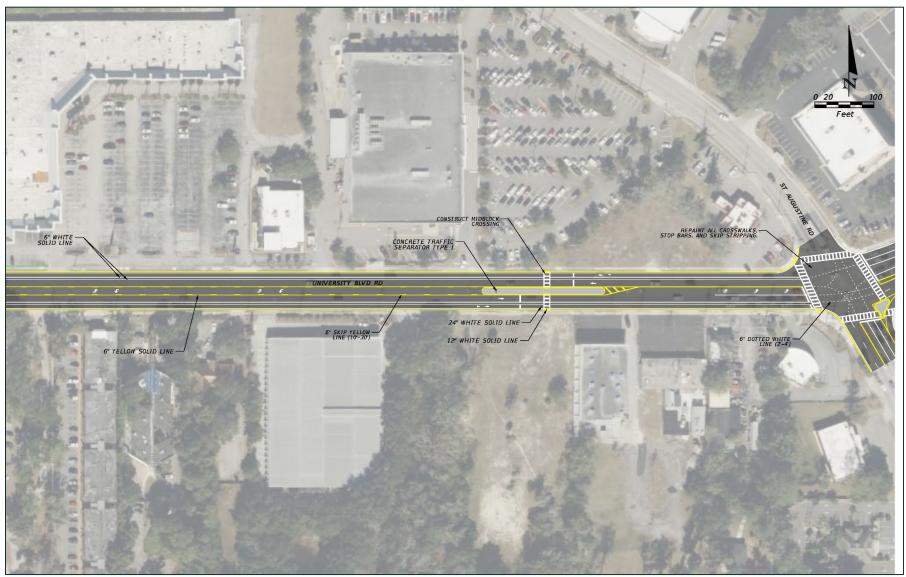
PROPOSED IMPROVEMENTS SHEET 5
